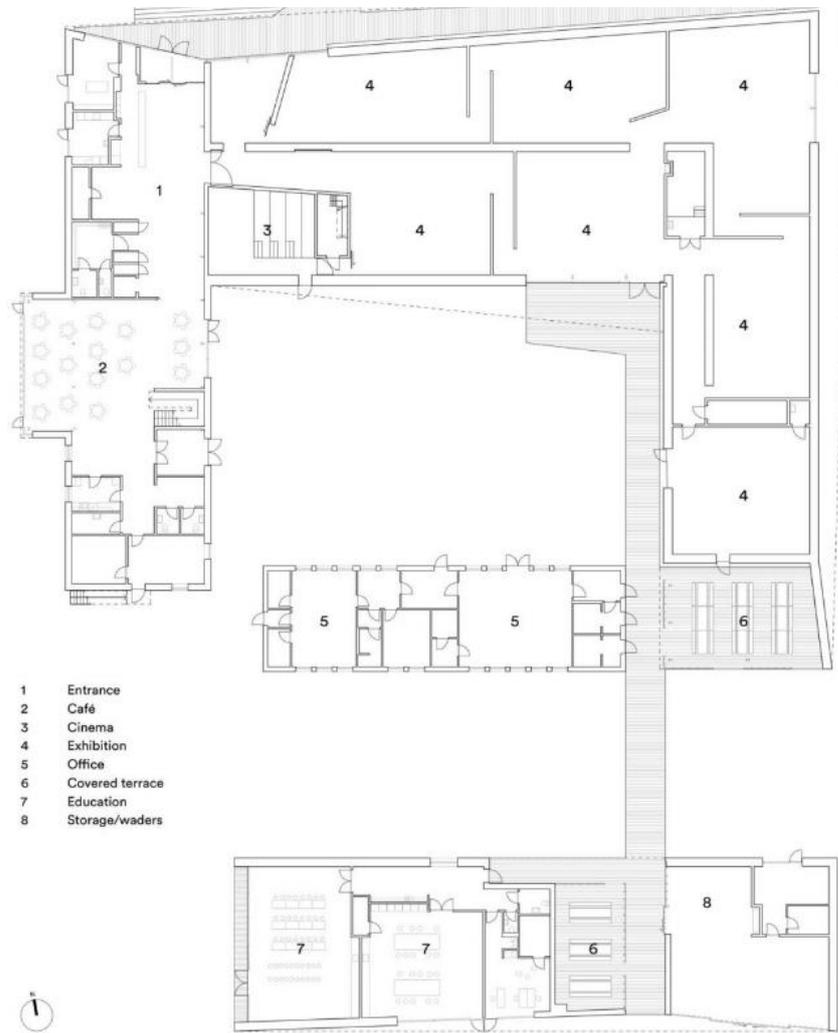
Site plan (Illustration: Dorte Mandrup)
